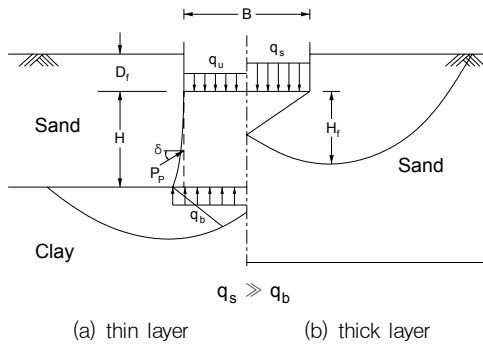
Failure of soil below footing on sand layer above soft clay
